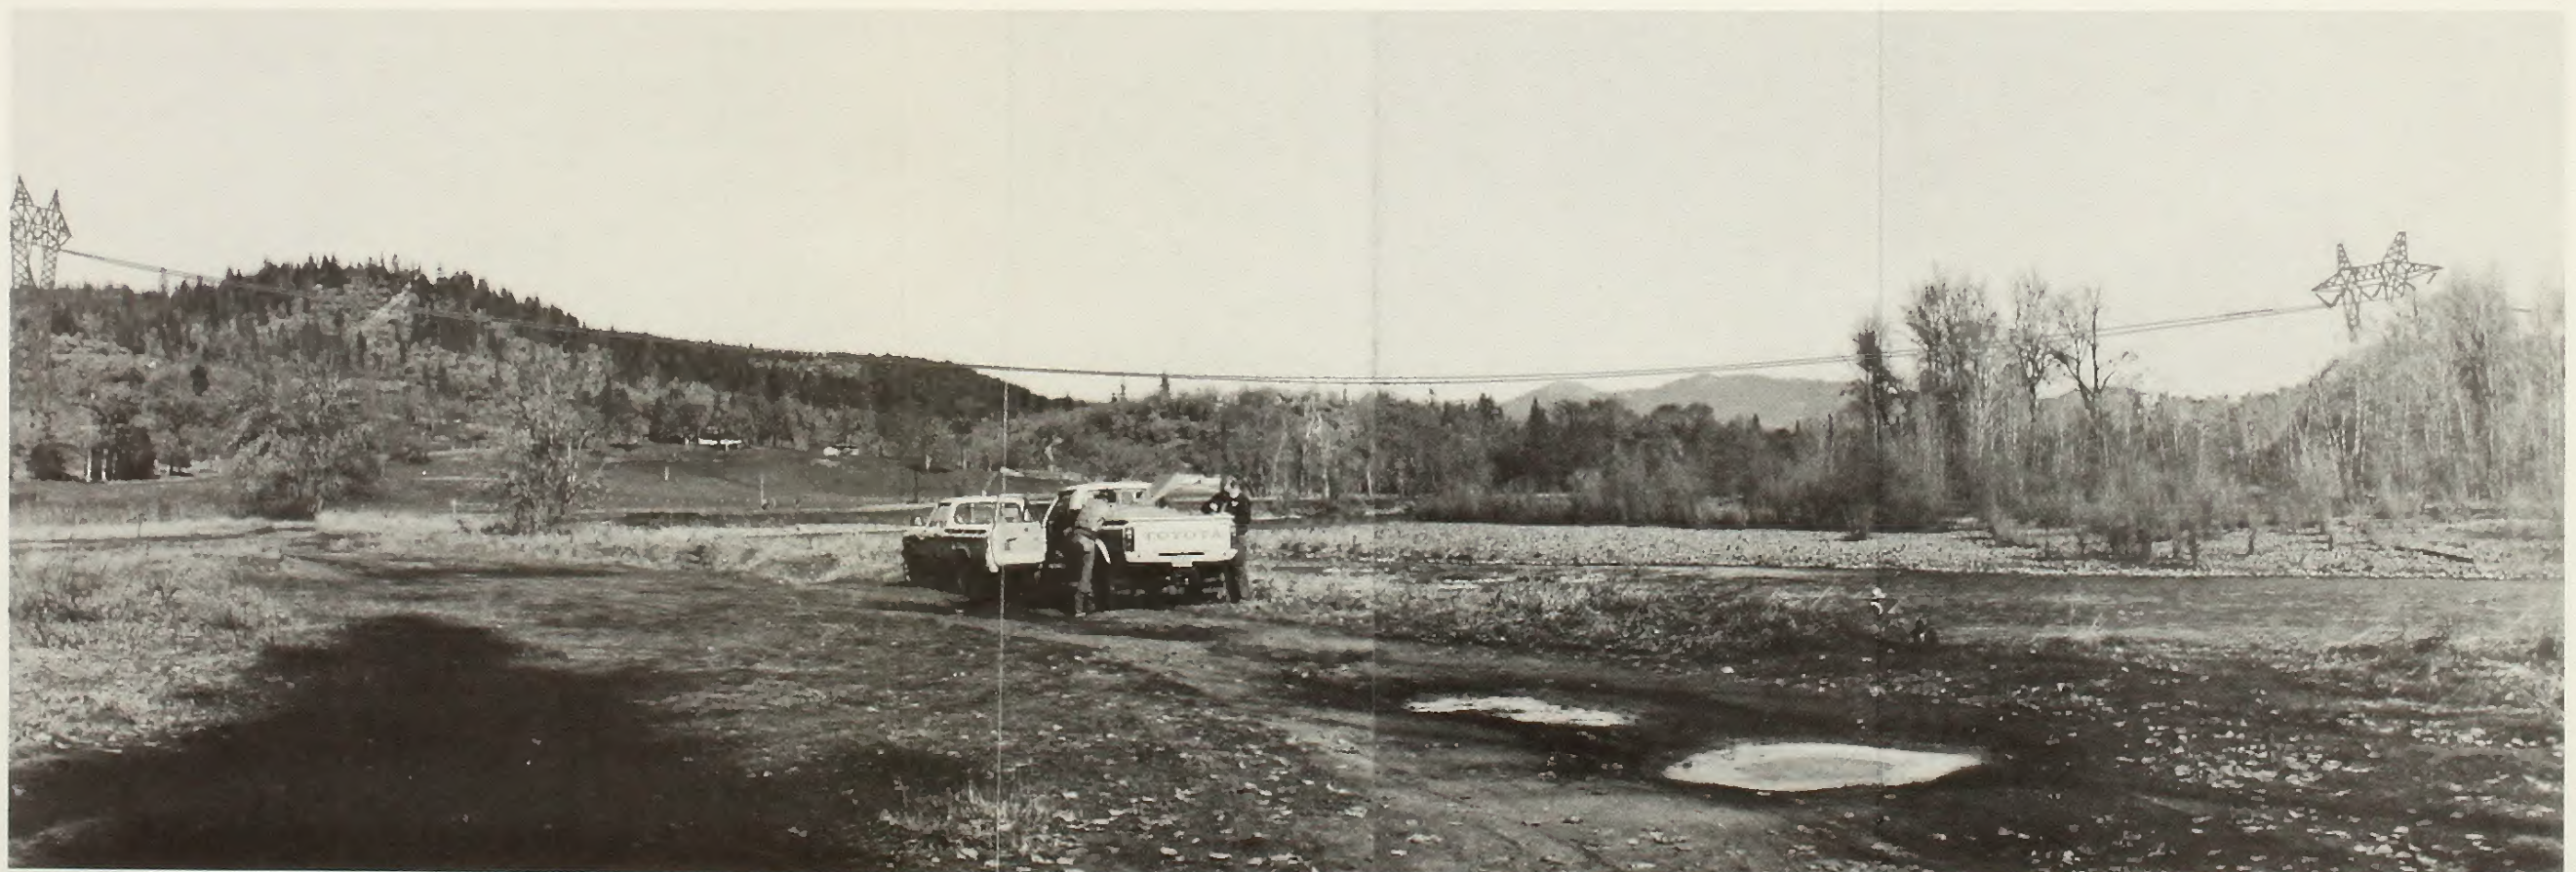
SIMULATED VIEW OF DRAFT PREFERRED ALTERNATIVE AT ROGUE RIVER CROSSING (SINGLE CIRCUIT STEEL LATTICE STRUCTURES). IN ACCORDANCE WITH A PLANTING PLAN TO BE NEGOTIATED WITH THE JACKSON PARKS AND RECREATION DEPARTMENT, TREES AND SHRUBS WOULD BE PLANTED TO HELP SCREEN THE LINE FROM RECREATION ACTIVITY AREAS.
